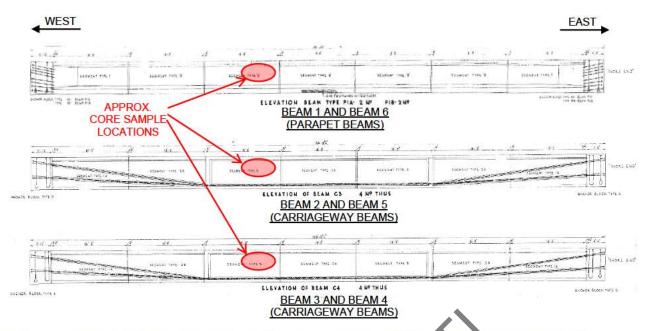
Beam elevation and location of core samples (extracts from drawings 5512/D9-1059 and 5512/D9-1054)
